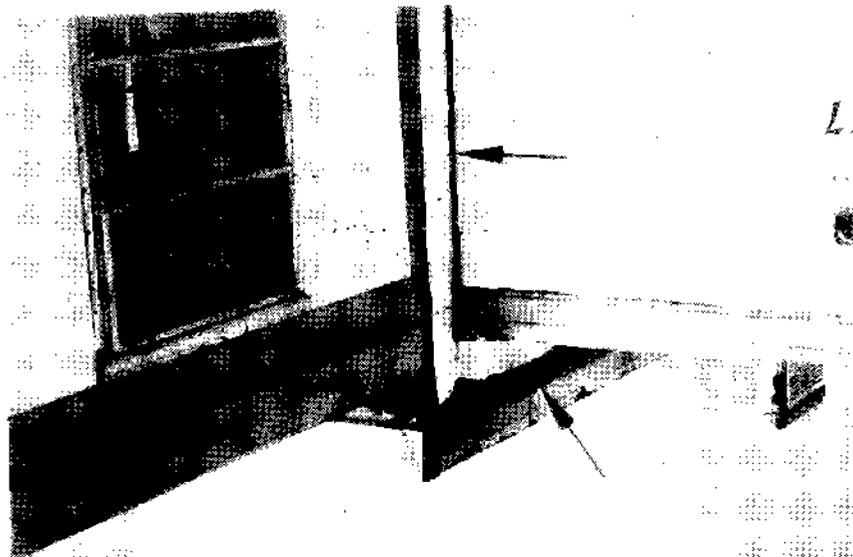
Ungasketed Heating Vent Pipe Attached With Sheet Metal Screws to Metal Roofing
